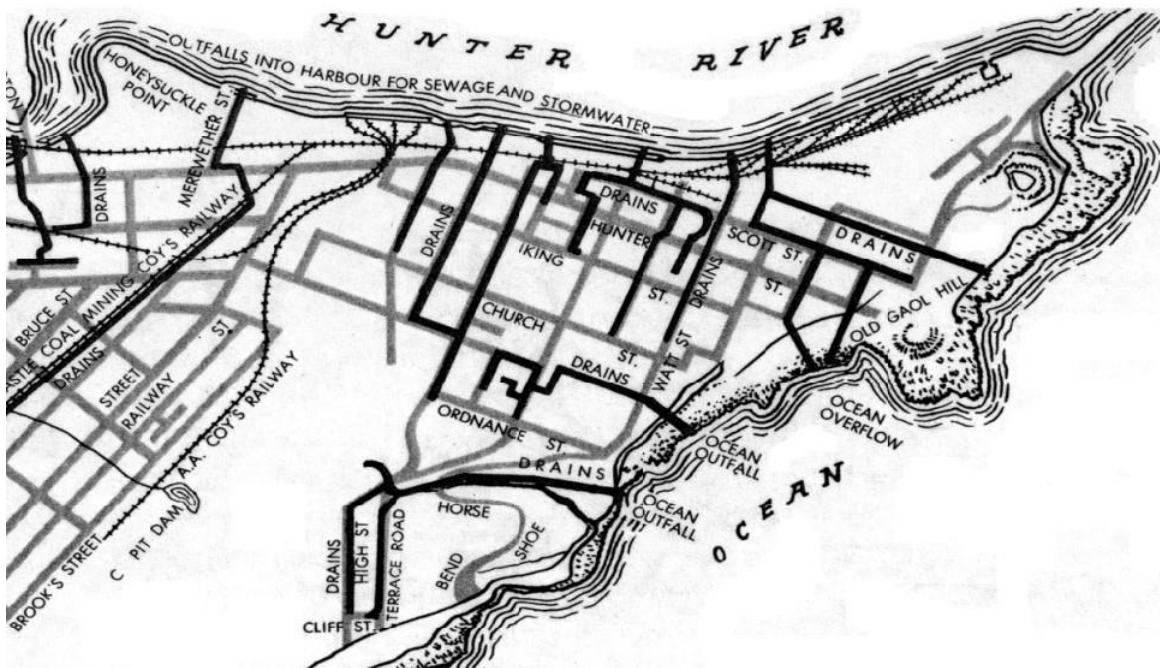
Detail of 1892 indicating locations of Stormwater and Sewerage Pipes
